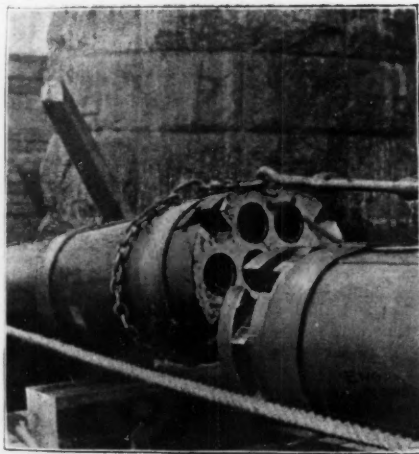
View Showing the Ends of Two Sections Ready to be Joined.
